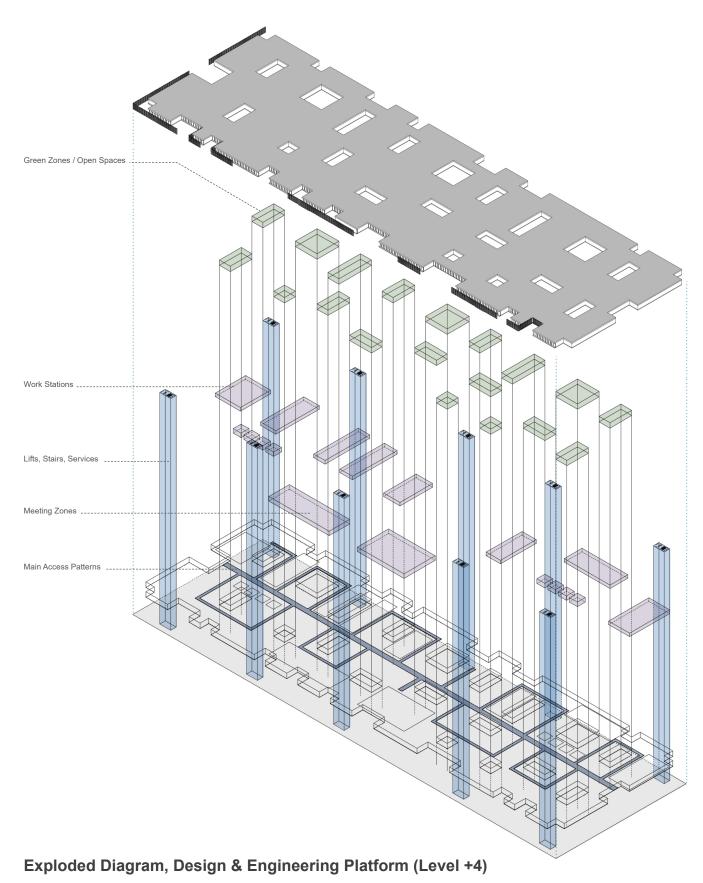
Future fulfillment center, design & engineering platform (Level +4)
